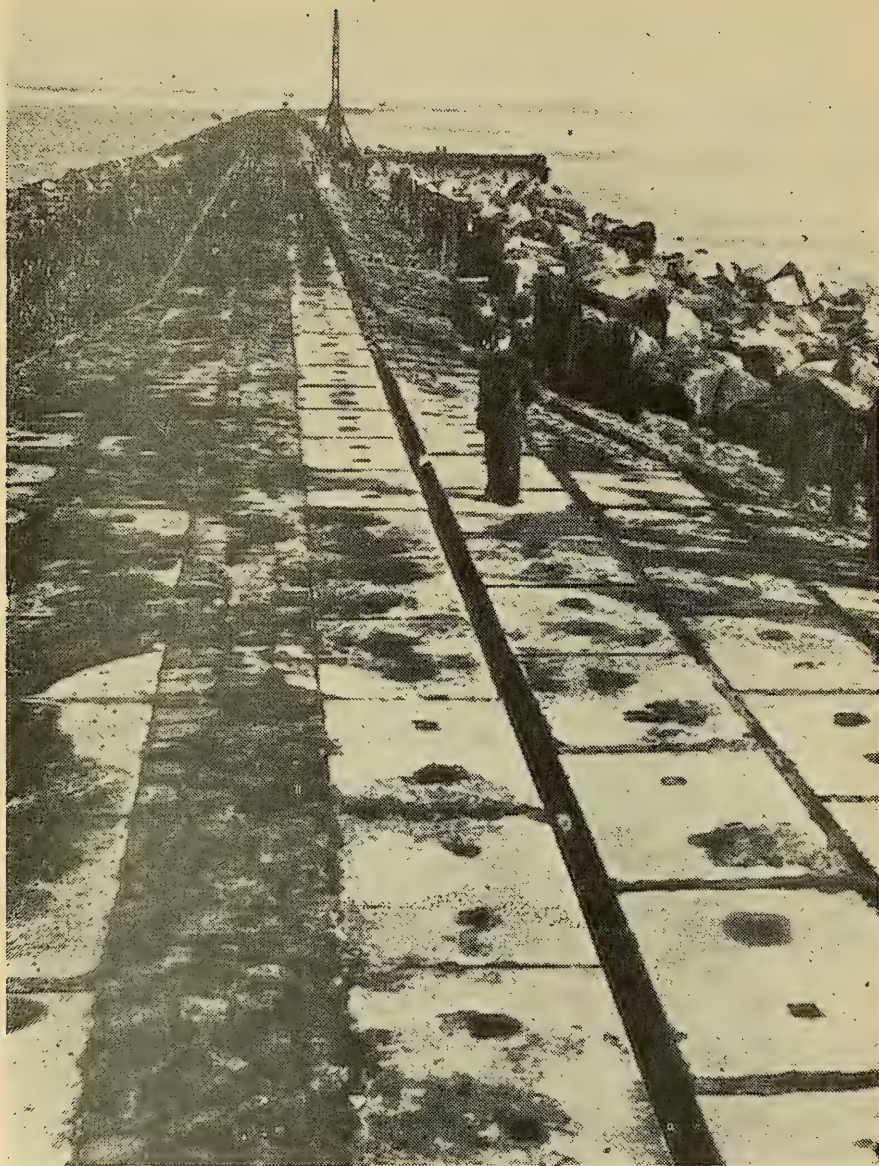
North pier, Hook of Holland. The conversion of the railroad track into track for trucks, consisting of concrete blocks and set stone with asphalt grouting carried out in 1948. The gutler to carry the lighthouse cable is in the center. In the foreground is the wide section near the foot of the lighthouse.
